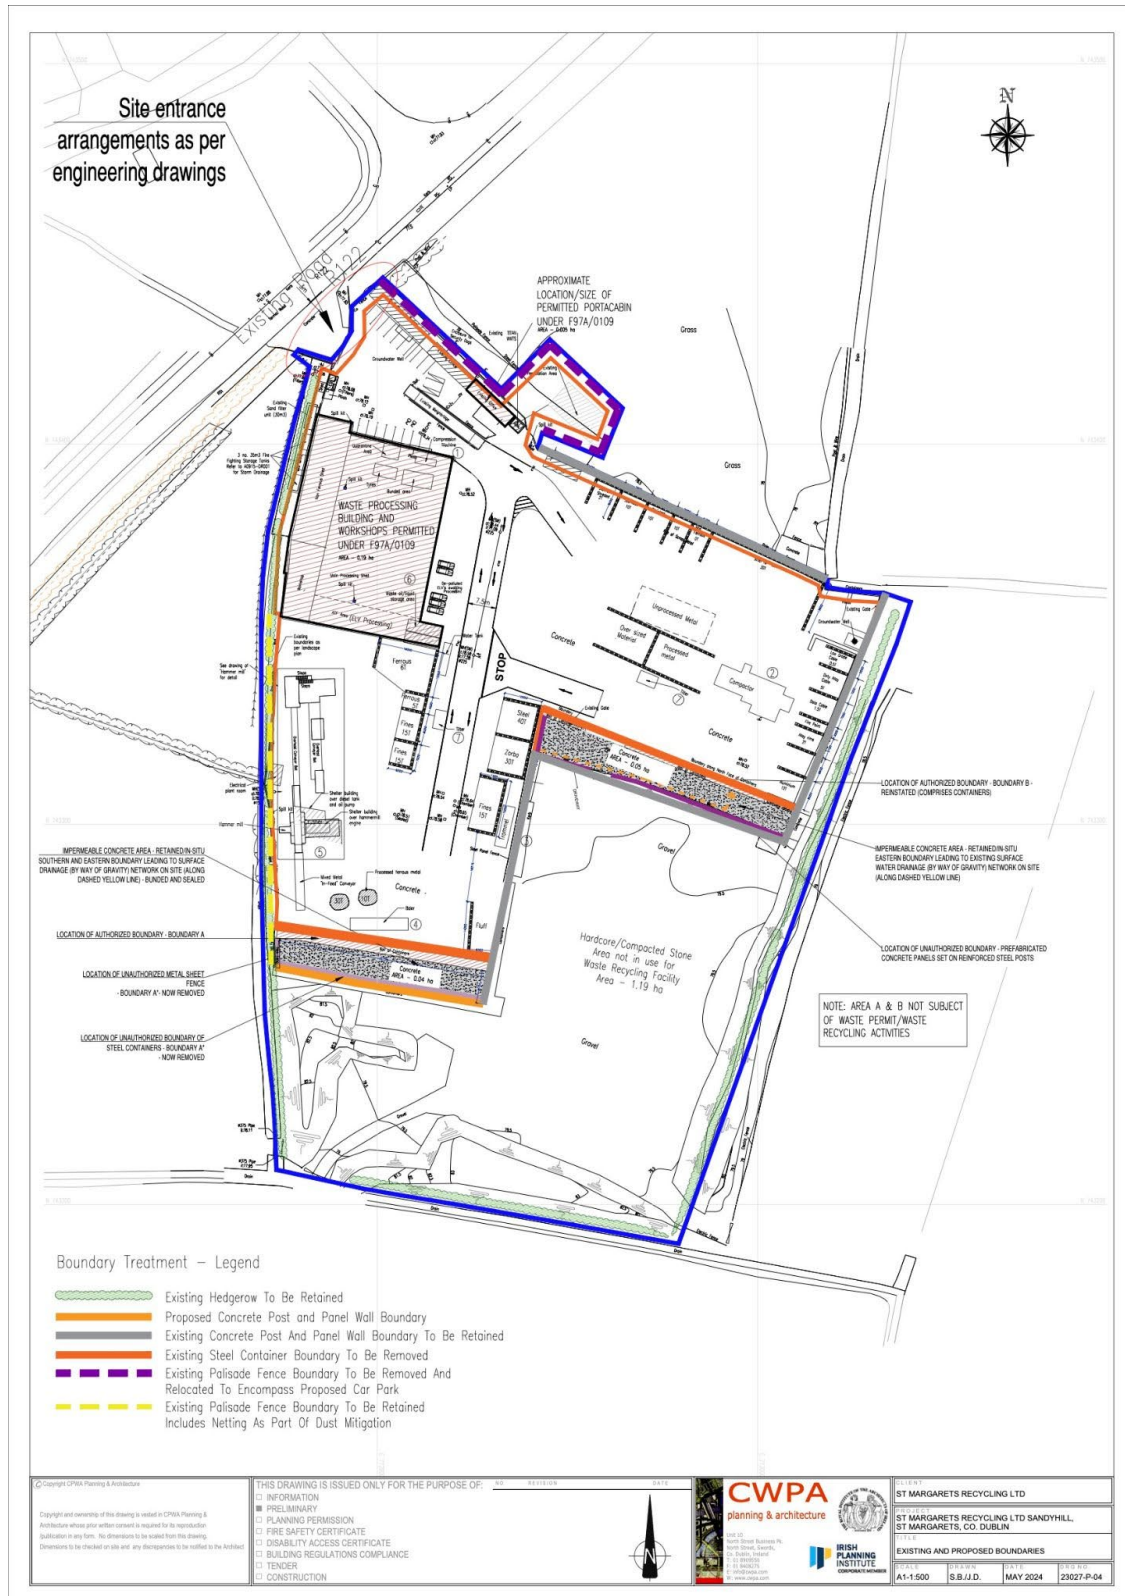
Existing and proposed boundaries of the proposed development site at St. Margaret's Recycling & Transfer Centre Ltd.
